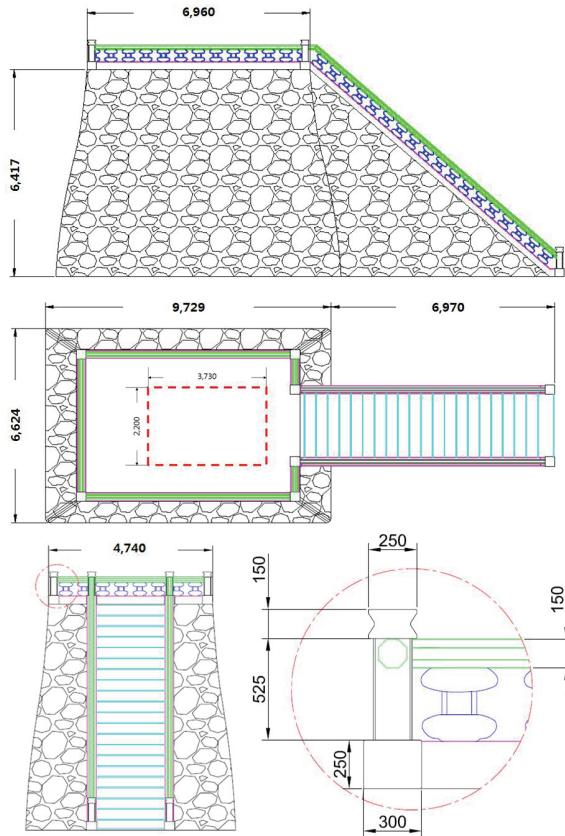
Drawing of Restoration of *Ganui-Dae*; Top-Side View, Middle-Floor Plan, Bottom-Front View (Left)/Handrail (Right) (Unit: mm, Red box of floor plan is the scale of *Ganui*).
